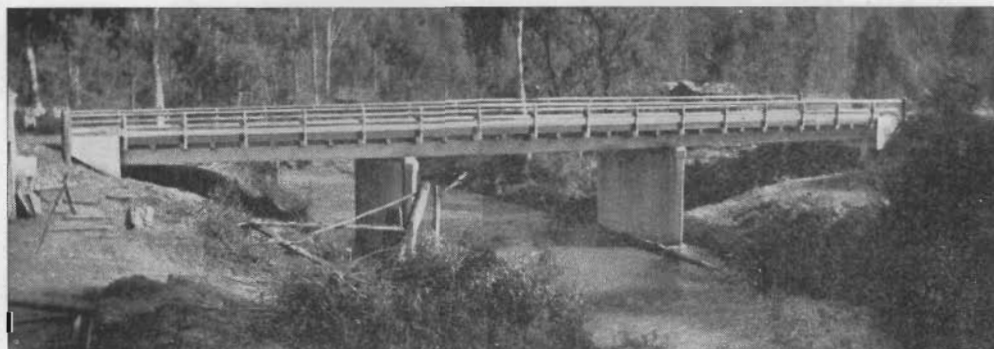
New bridge over Yarra River on Reefton Spur Road.
